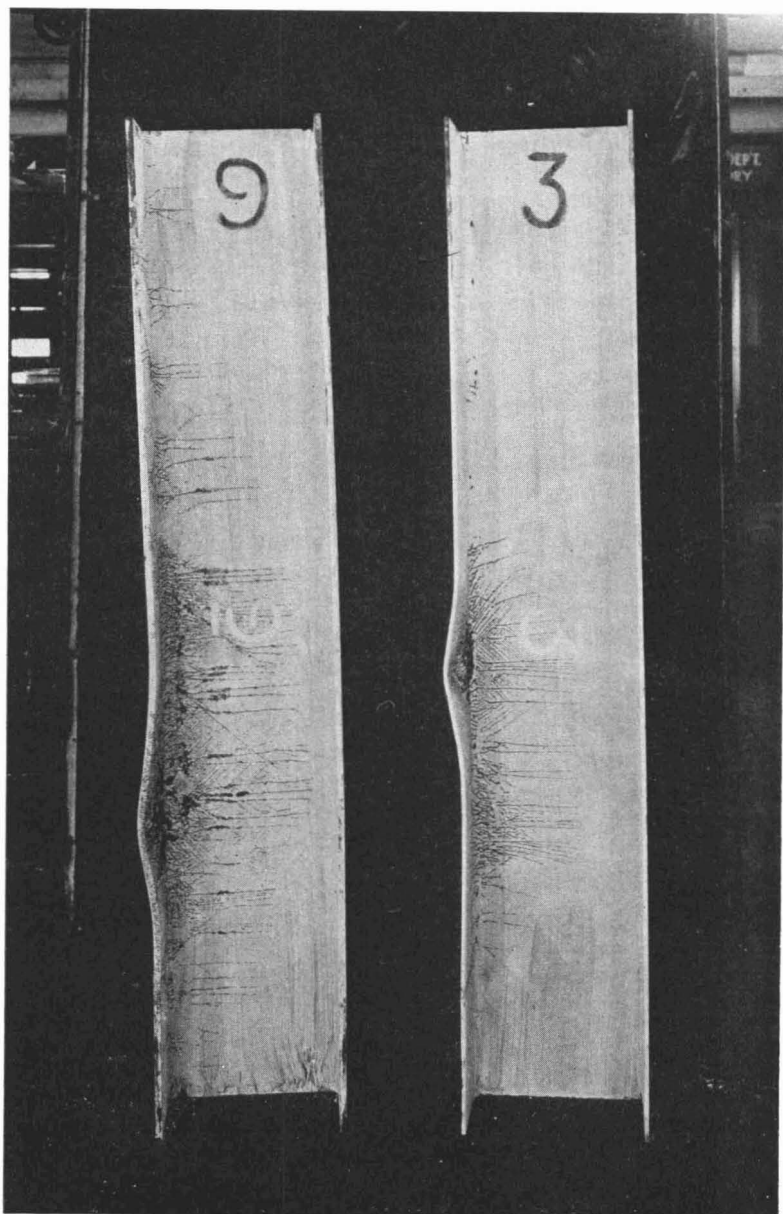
Typical condition of test specimens after test (kern point loading, test S-10 and S-7).
